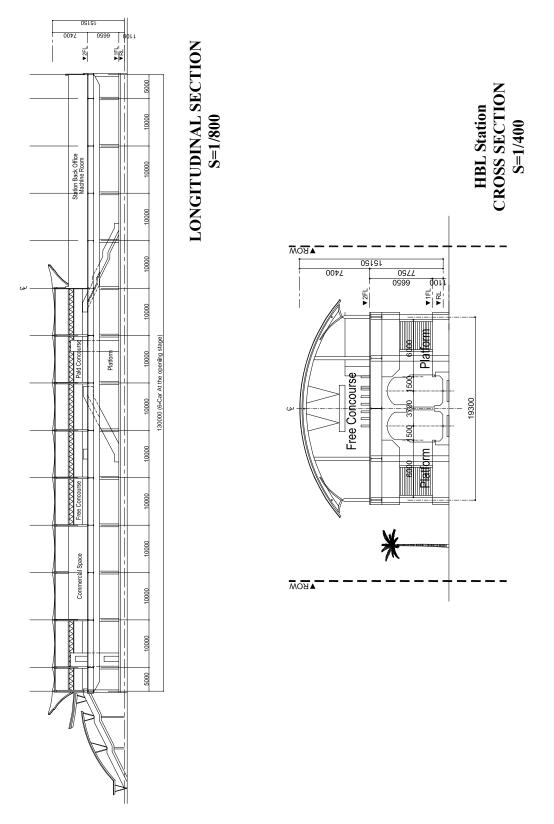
Station Architect Conceptual Plan (HBL Station)
